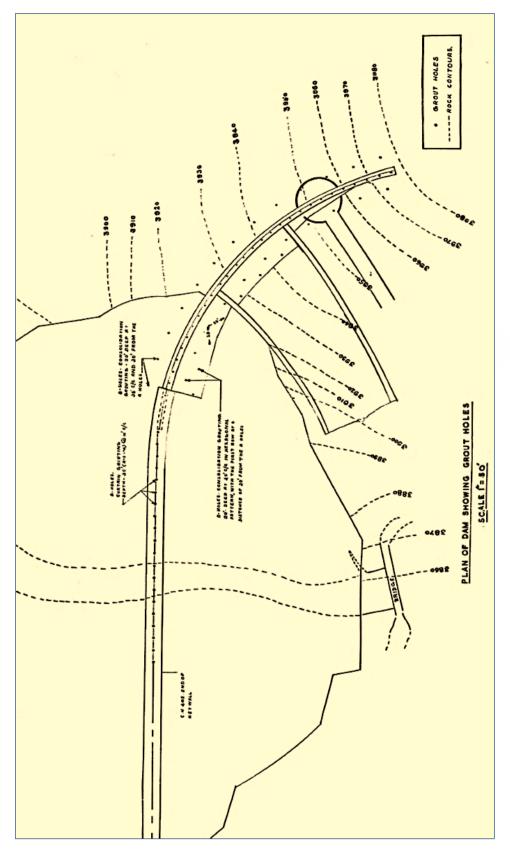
Anayirankal Dam – Foundation Grouting Plan
